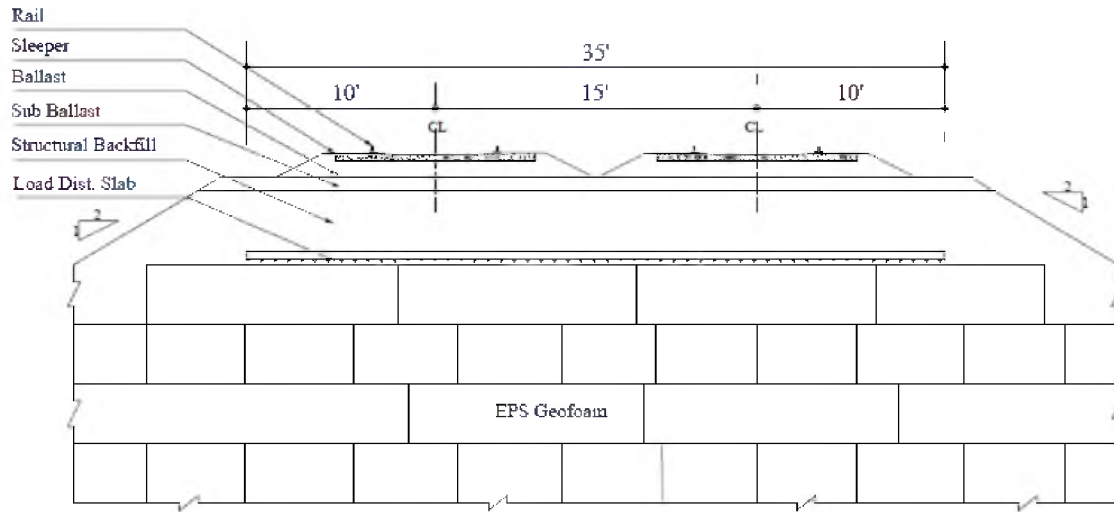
Cross-section of an EPS geofoam embankment at corner canyon of Draper City of Utah
